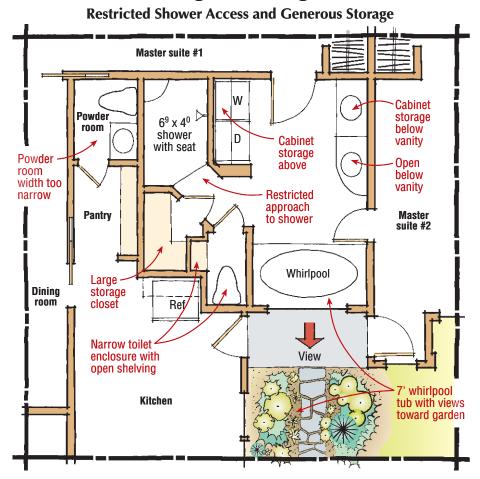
Although pleased with the general plan, the clients wanted the 13x14 master bathroom layout to anticipate future wheelchair access. Adjacent rooms and a tub with a garden view prohibited expansion, so the author was limited to reconfiguring the interior space. A too-tight powder room also needed attention.
